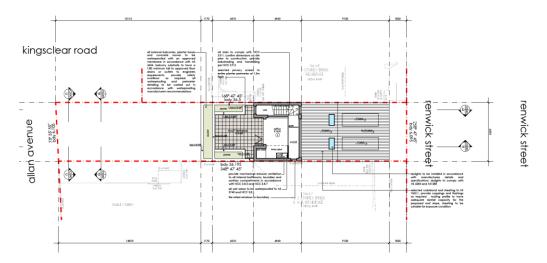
Proposed second floor plan demonstrating the 18sqm rooftop terrace
